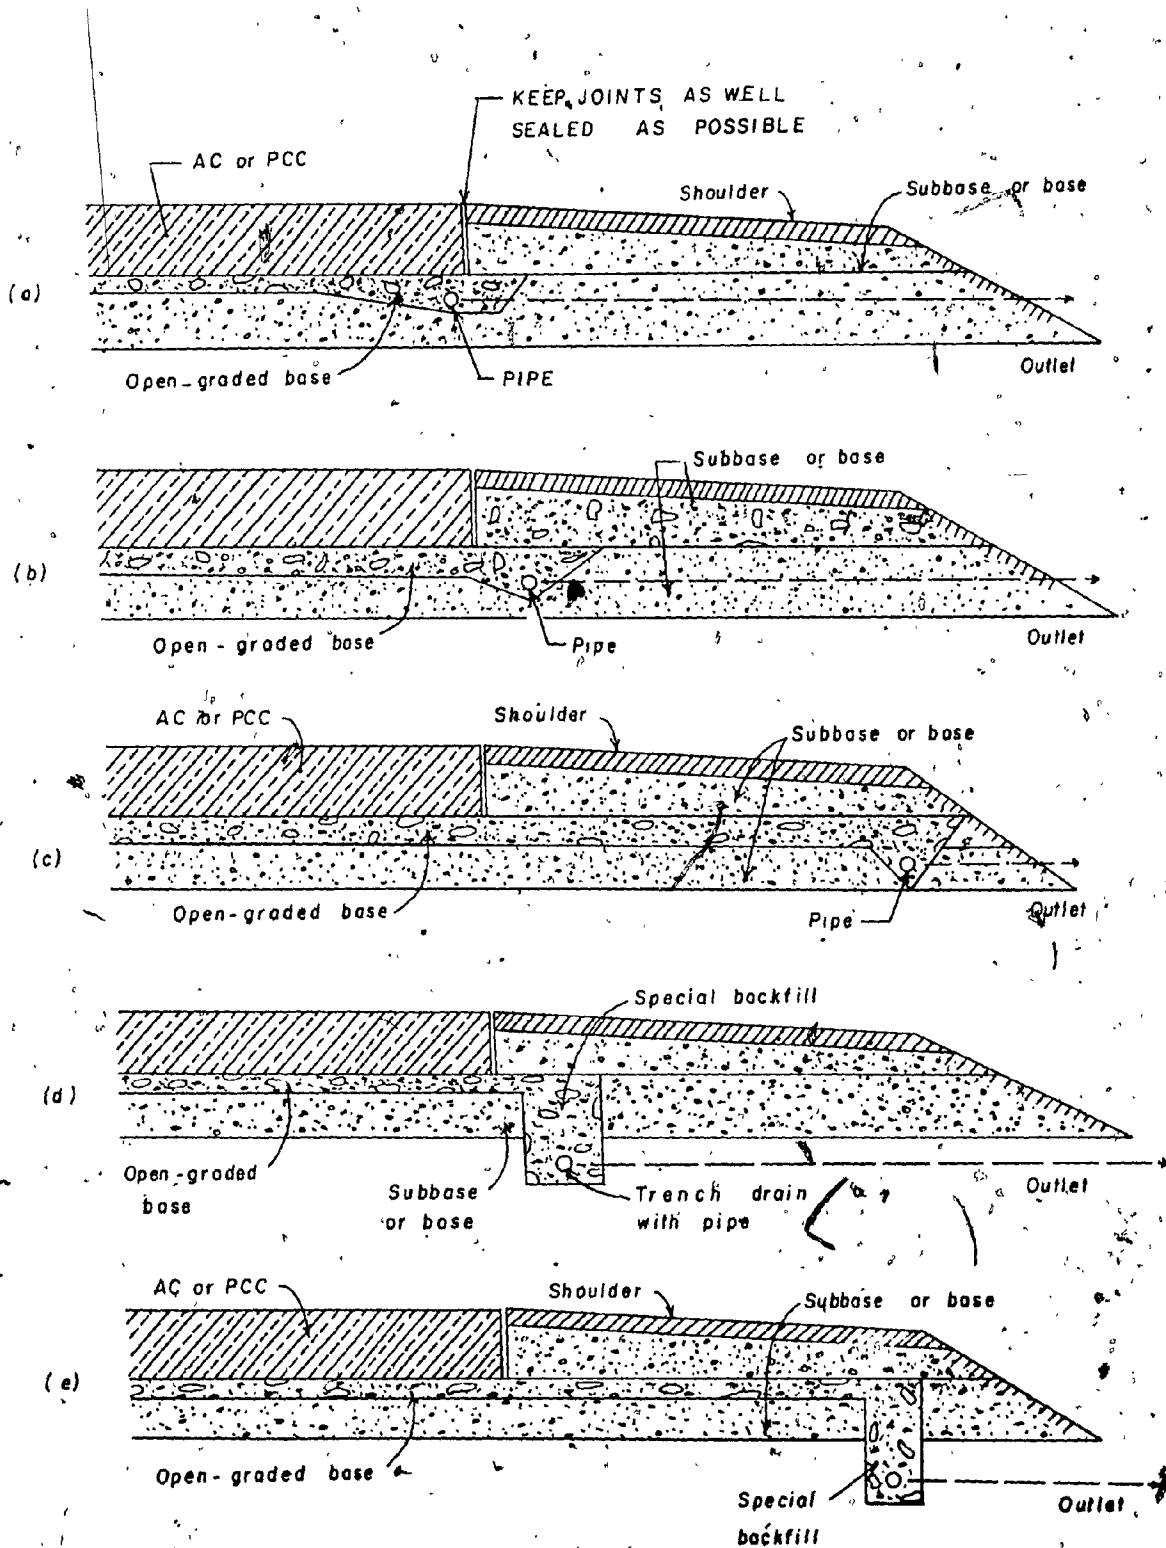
Typical details of outer edges of drainage systems.
